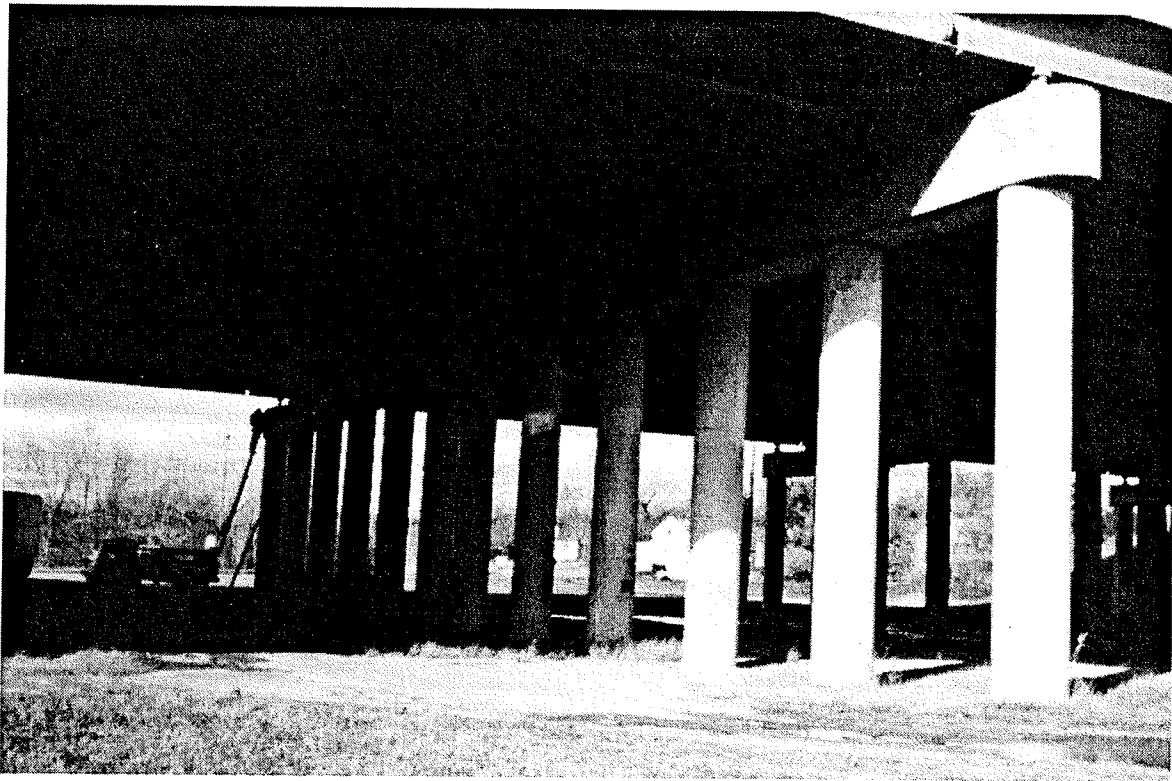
Photograph of Bridge No. X01 of 25085B, Bridge over Fenton Road, Thread Creek, Michigan.
